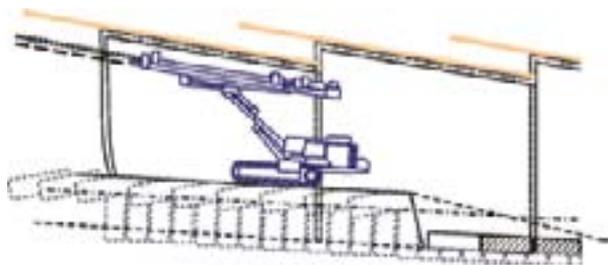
Longitudinal section, which shows an example on how to use pipe bolts
